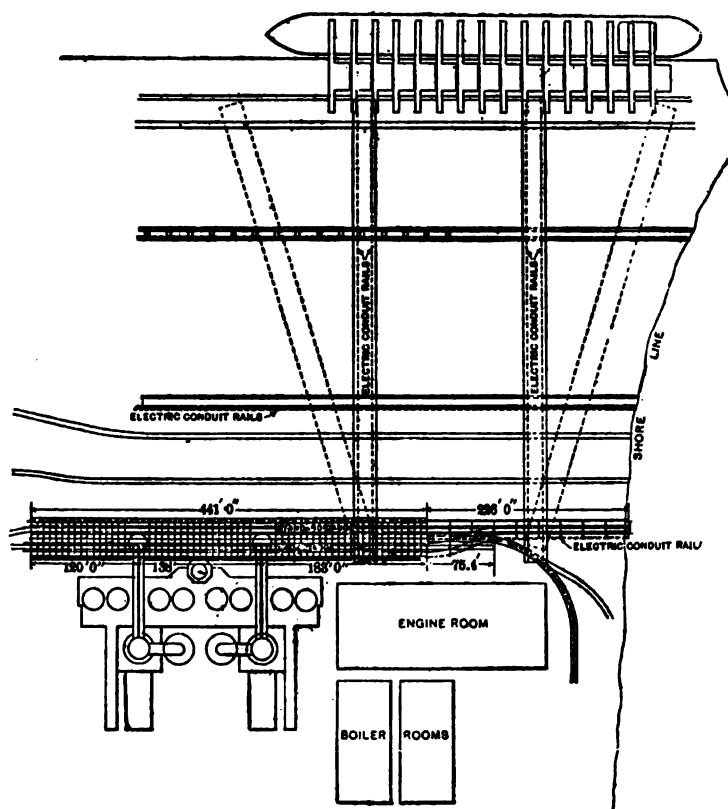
Plan of Hoover & Mason's Ore-handling Plant.
